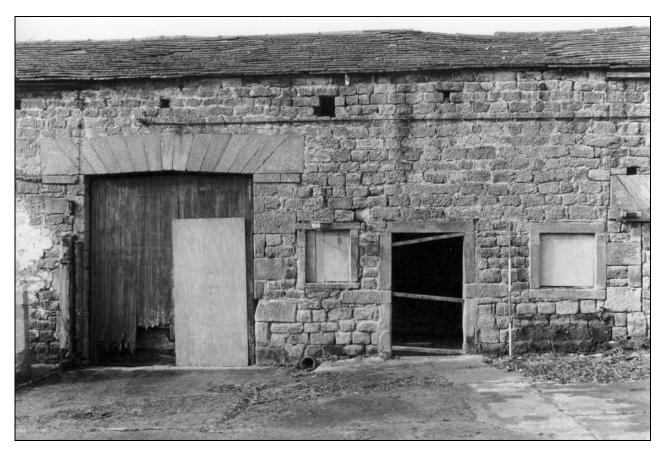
East side of barn range, showing cart entrance and doorway to present milking parlour (film 5, frame 16)
